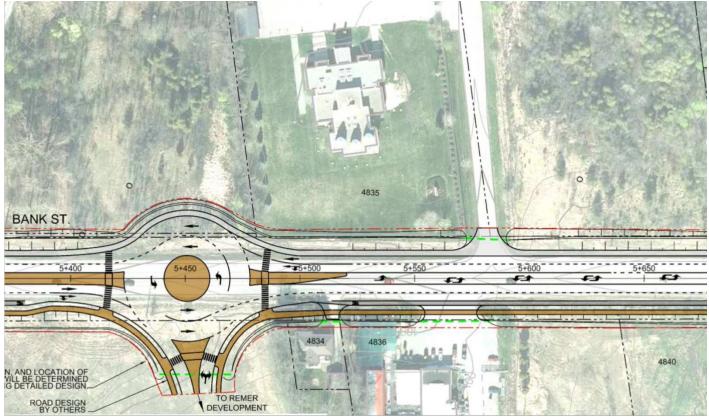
Schematic of proposed Bank Street widening (Bank Street EA 2014)
